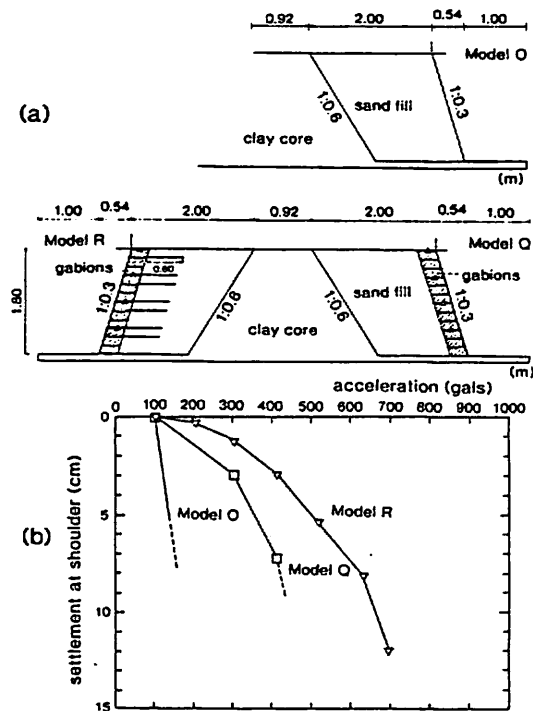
Effects of the use of a gabions facing and geotextile-reinforcing on the stability of sand walls under seismic loading conditions; (a) the test arrangements, and (b) the settlement at the shoulder of the slope versus the horizontal acceleration at the shaking table (Koga et al., 1992).
